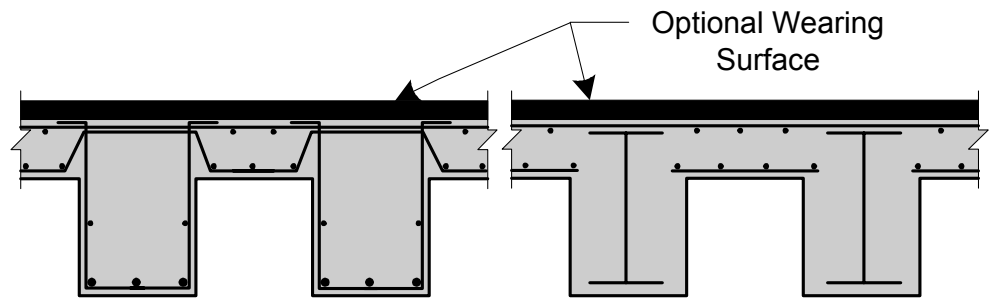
Comparison Between Tee Beam and Concrete Encased Steel I-beam
